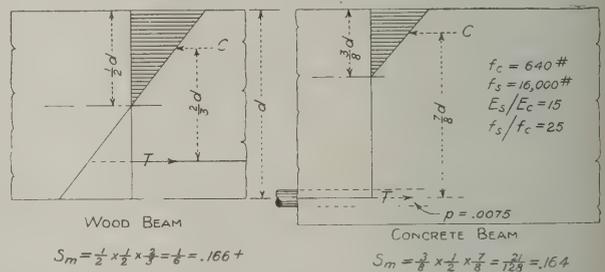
Comparison of Section Modulus of Wood and Concrete Beams
